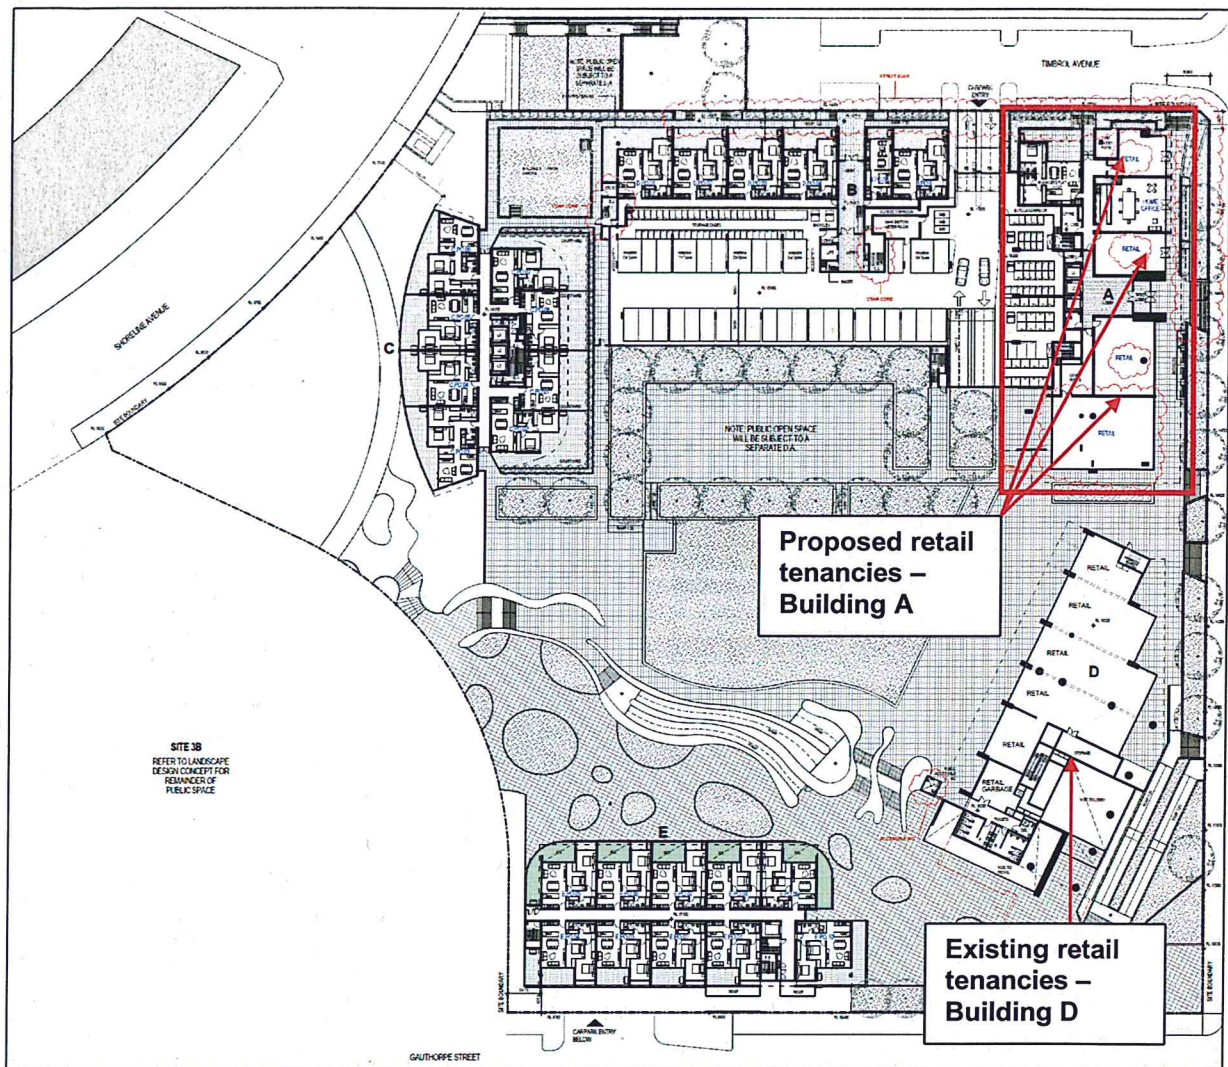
Existing and Proposed Retail Tenancies – Podium Level, Sites 2A & 3A
